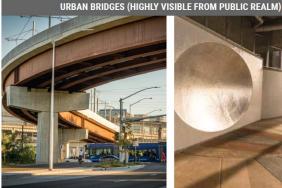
IMAGE SOURCE: TRIMET STEEL STRUCTURE OR INTEGRATED PLACEMAKING
